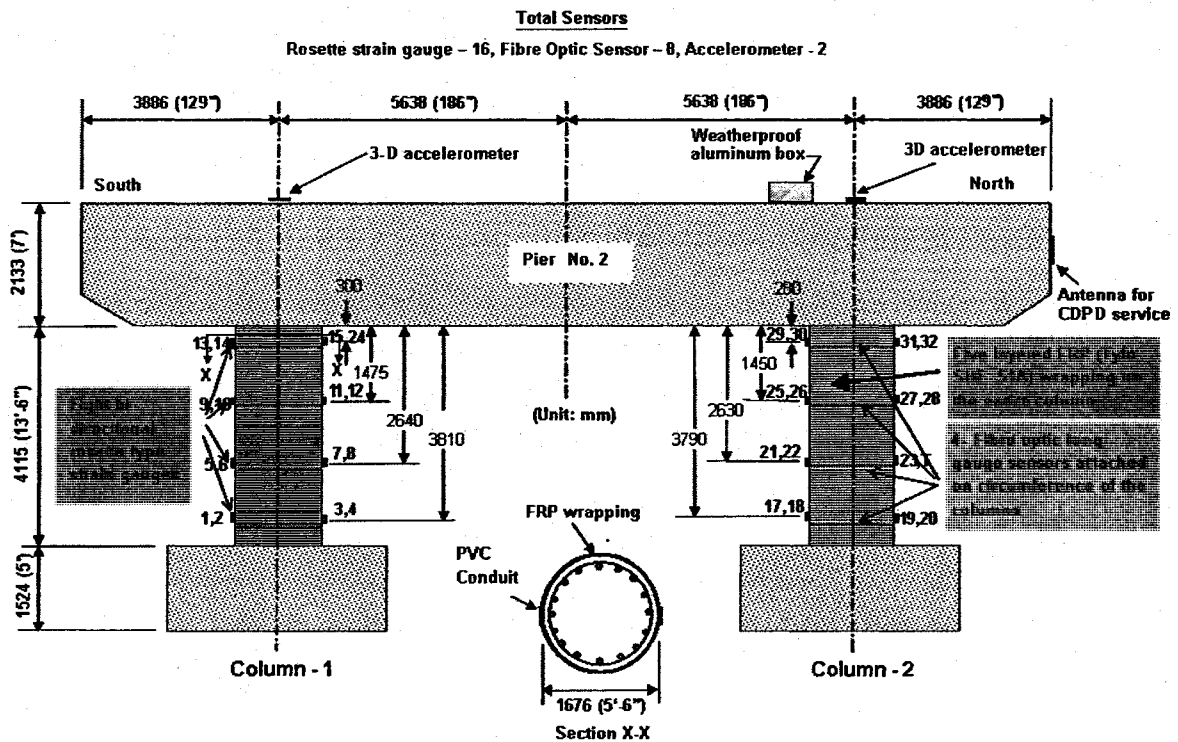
Portage Creek Bridge Elevation of pier-2 (short columns) with sensor locations. (Huffman et al, 2006)
